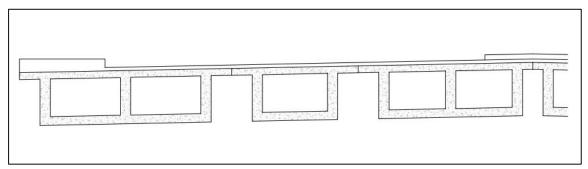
Half of Precast Concrete Box Girder Arrangement (Alloy Consulting Ltd., 2015)
